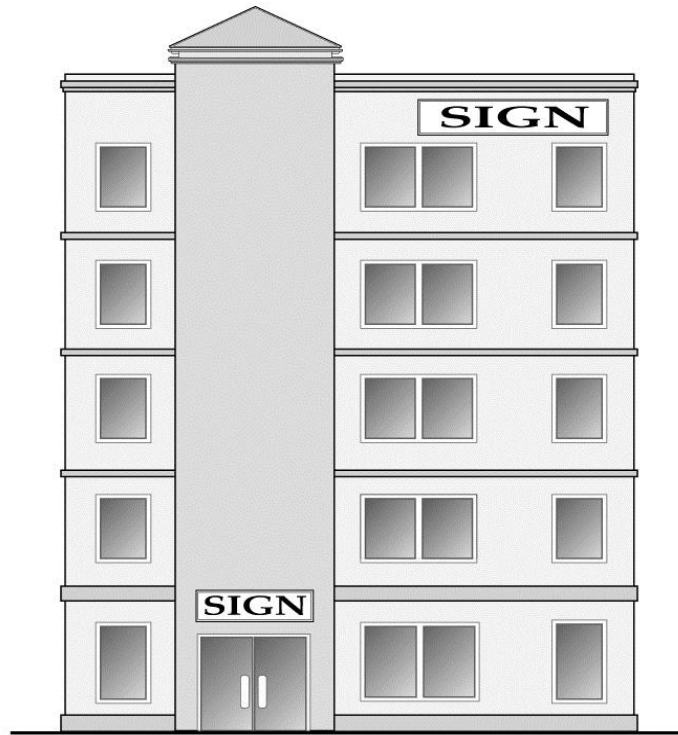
A-2: ALLOWED WALL SIGN LOCATIONS ON MULTIPLE-STORY BUILDINGS GREATER THAN THREE STORIES
